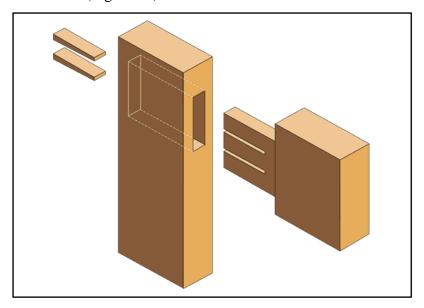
Straight tenon joint (Source: Various mortise and tenon joints
